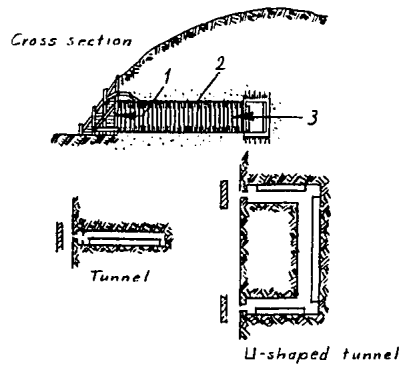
Plan of the Construction of a Tunnel. 1 - entrance; 2 - wooden beams; 3 - tunnel.
